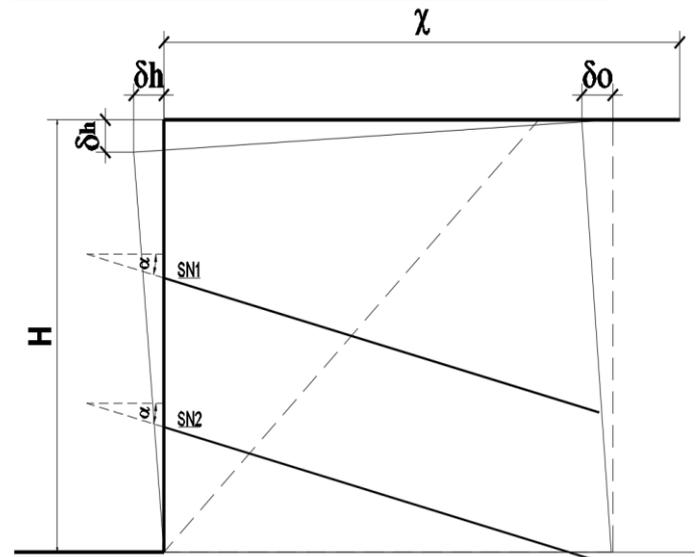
Deformation of soil nailed wall adopted from Lazarte et al. (2015).
